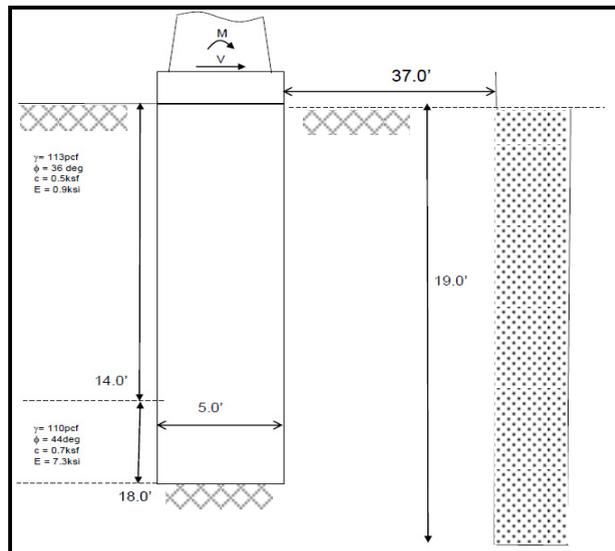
Cross Section View of the SRP Pole and the Proposed Excavation
